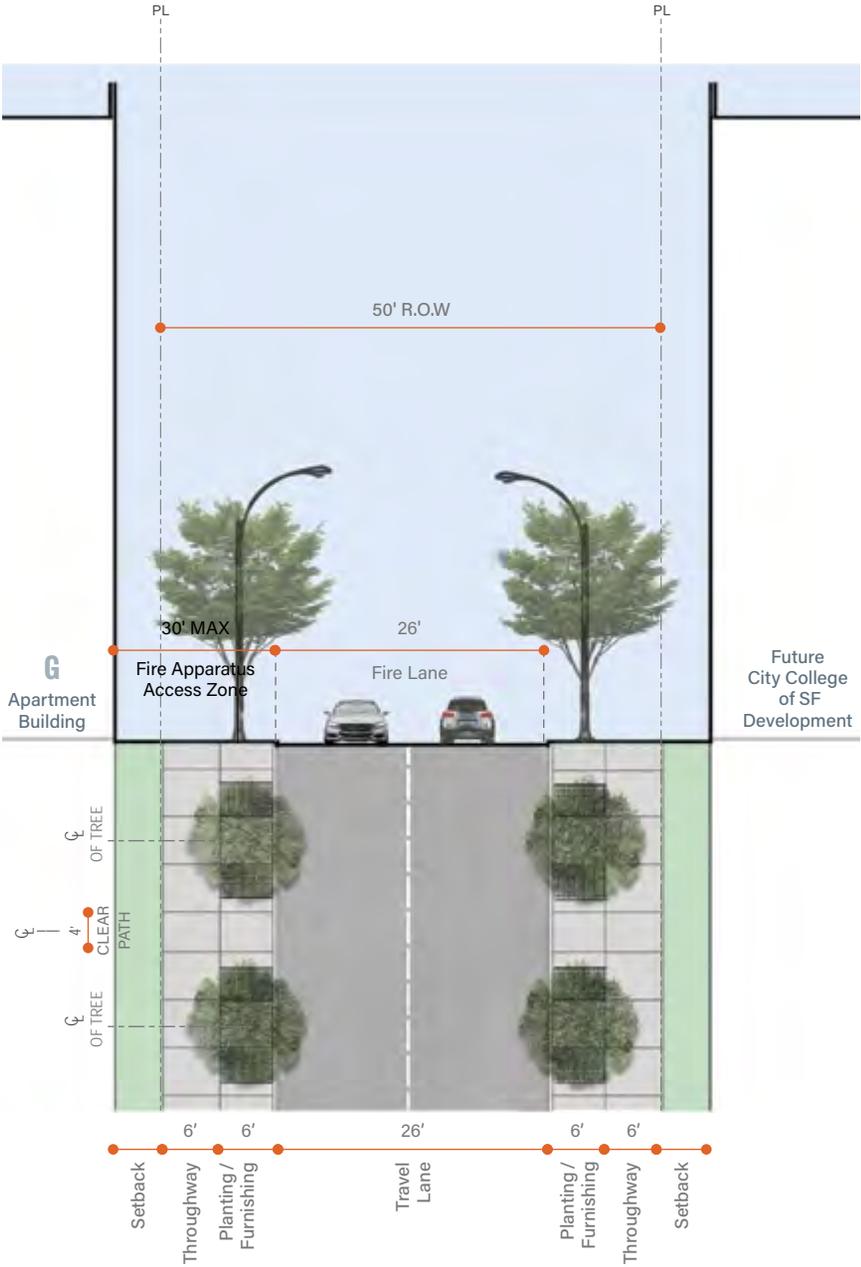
Lee Avenue, Section 1 *see "Figure 5.12-2: Lee Avenue, Plan Enlargements L.1-L.5", Site Plan L.1
